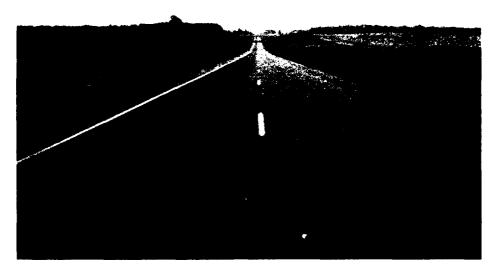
Typical flexible pavement section on Route 131, Michigan.
